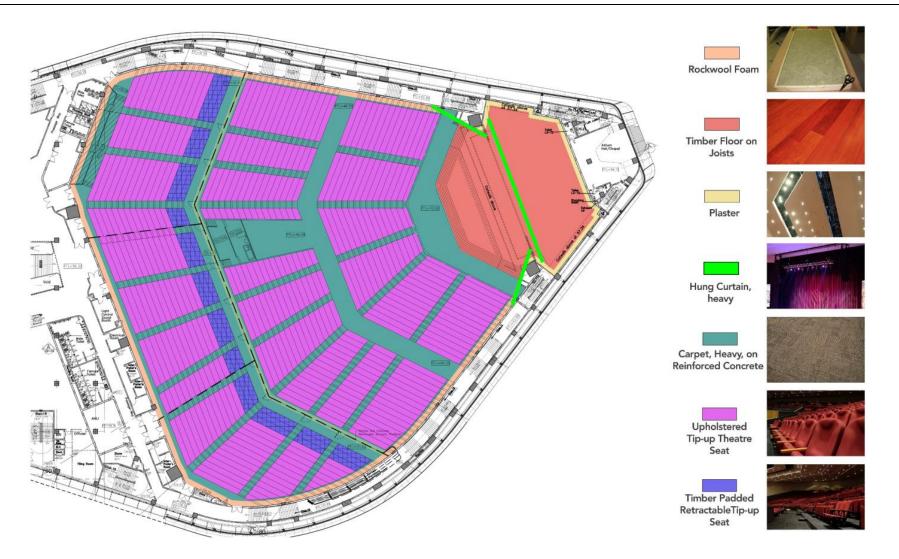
Calvary Church: Wall & ceiling surface finishes in plan.
